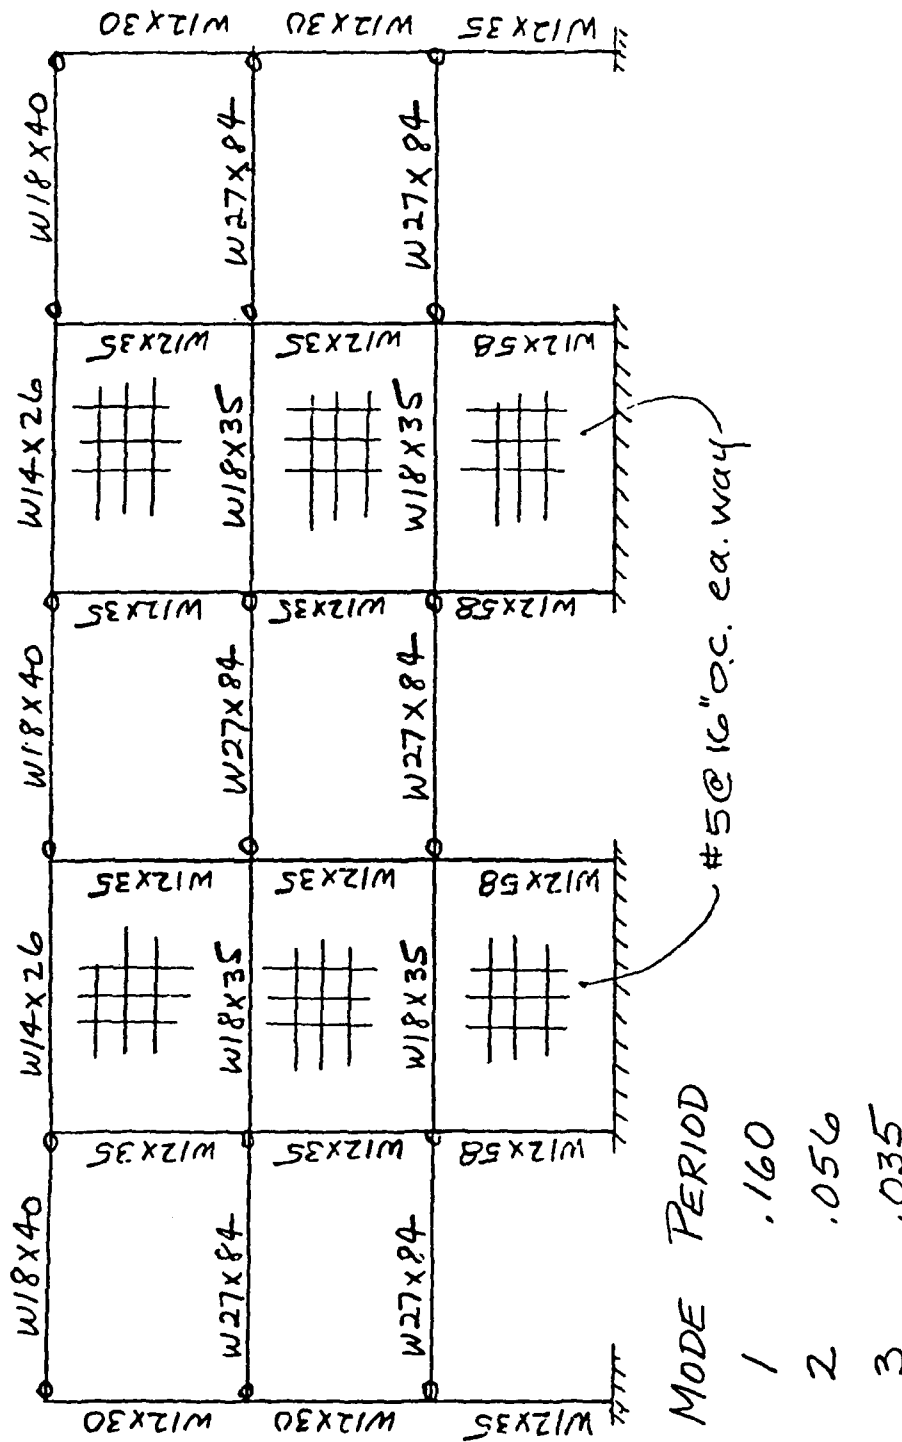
Shear wall frame, 0.15g base acceleration, 12-inch masonry.
